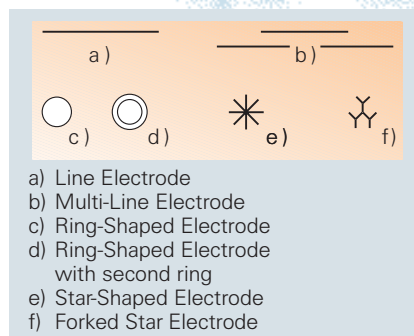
Plan view of a typical design of horizontal land electrodes
